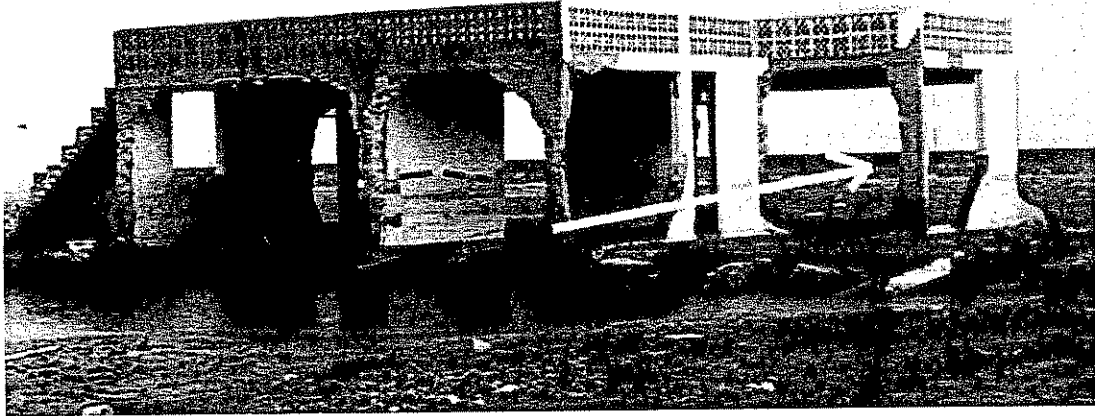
Damaged summer home, La Punta. Typical construction consists of reinforced columns on a 20-30 cm thick concrete slab foundation with unreinforced brick infilled walls. Walls perpendicular to the direction of the tsunami (arrow) failed. Dashed line on remaining center wall shows a stagnant watermark.
